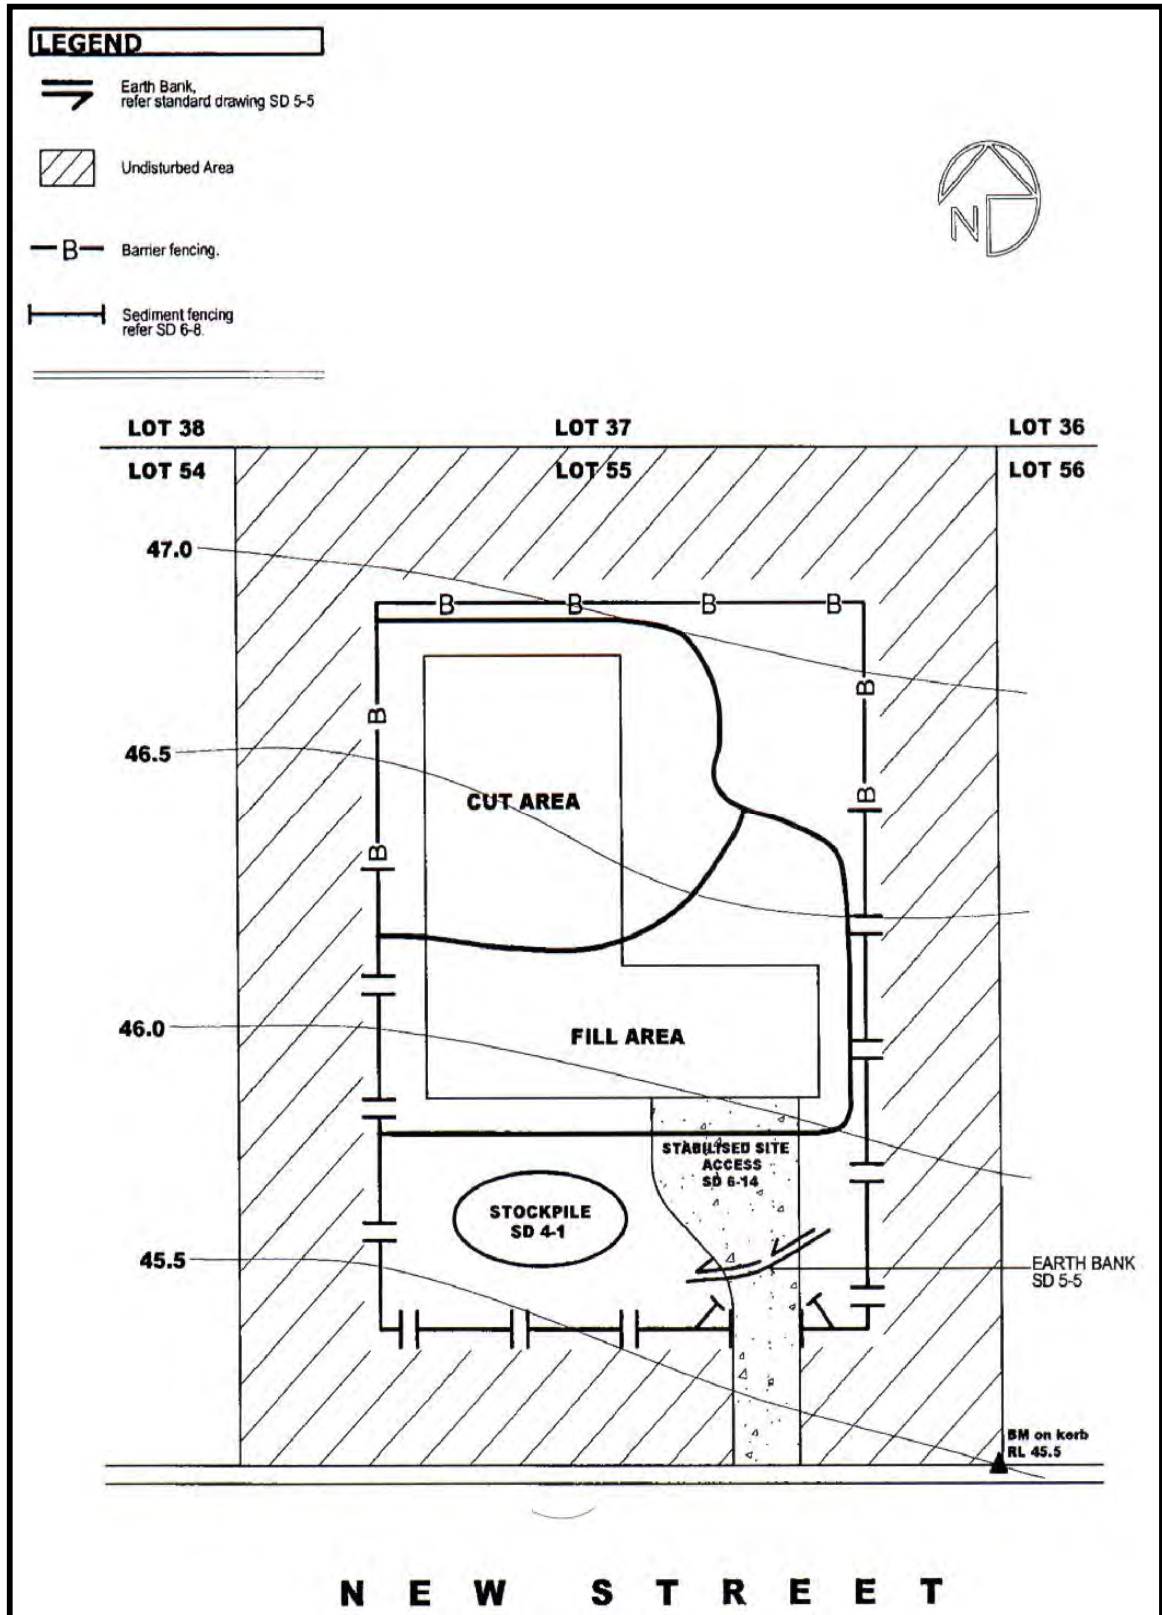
Typical Detail for a Residential Erosion and Sediment Control Plan (ESCP)
